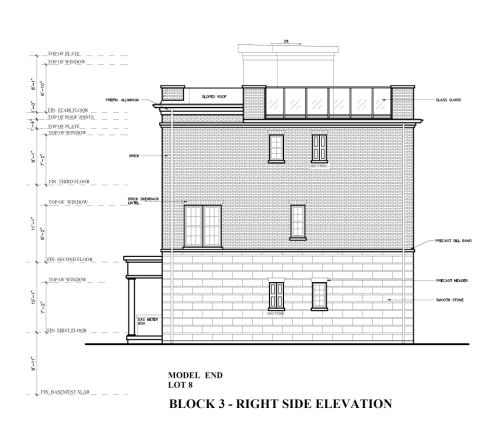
Block 3 Right Side Elevation (model end), Sheet A4 (FBP Architects Inc., September 1, 2023)
